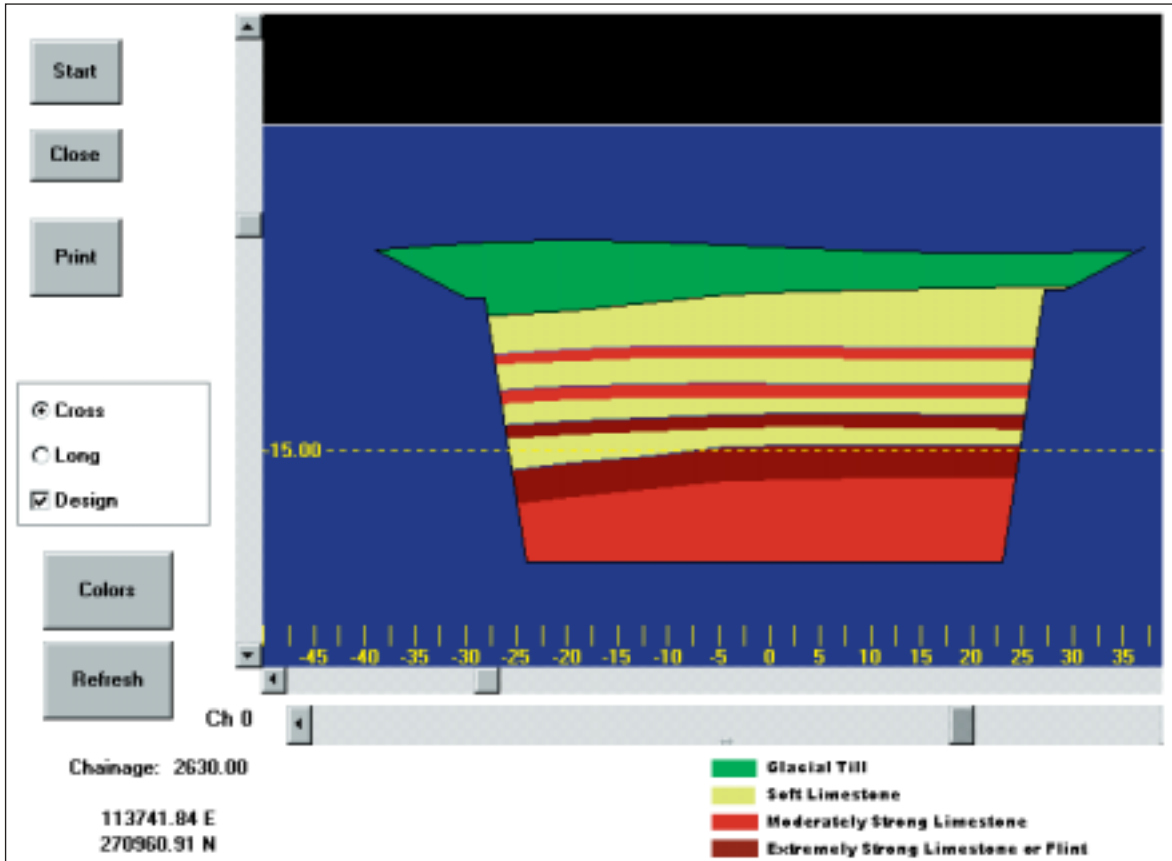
Cross-section of the Tunnel Trench at chainage 2630 with the various types of soil to be dredged.
